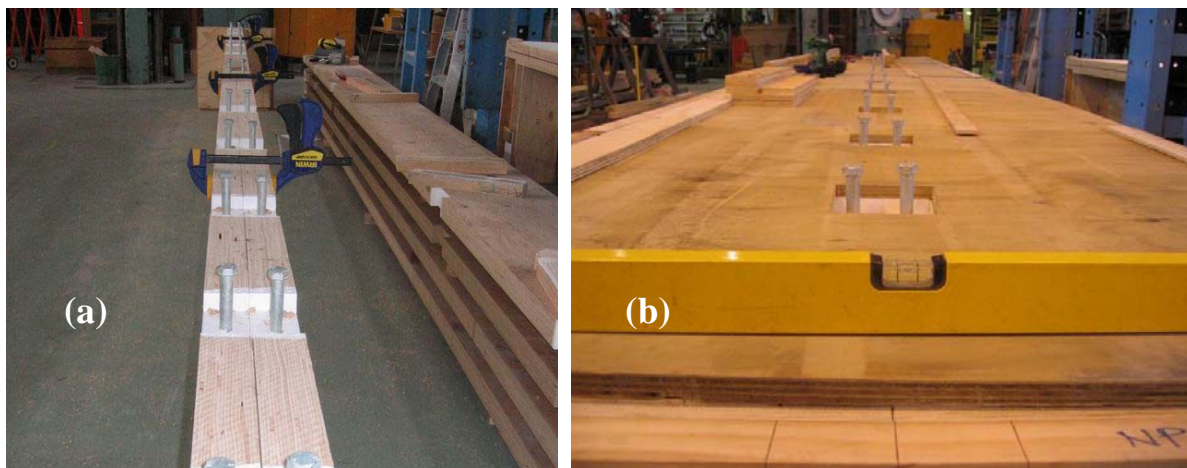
Construction of beam G1: (a) double 150 mm rectangular notch with coach screw; (b) formwork leveling
